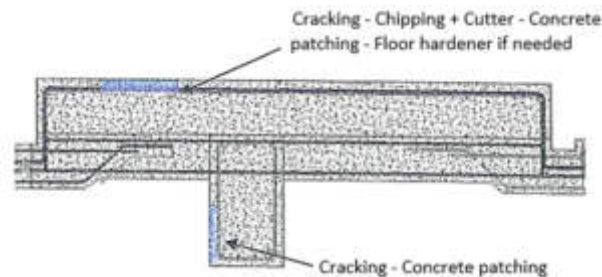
Repair Methods of Non-Structural Crack Damage to Concrete
